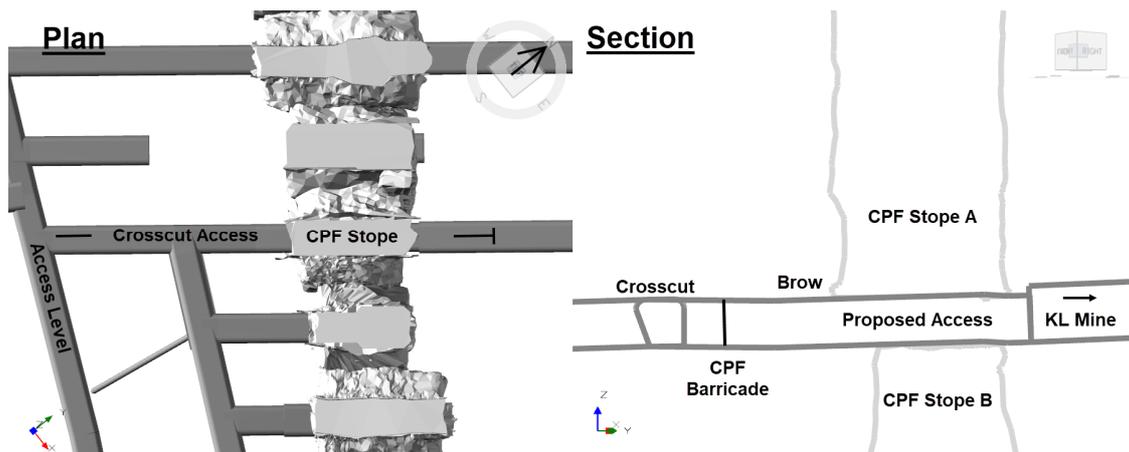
Plan and section view of the proposed design cemented paste fill (CPF) drift
